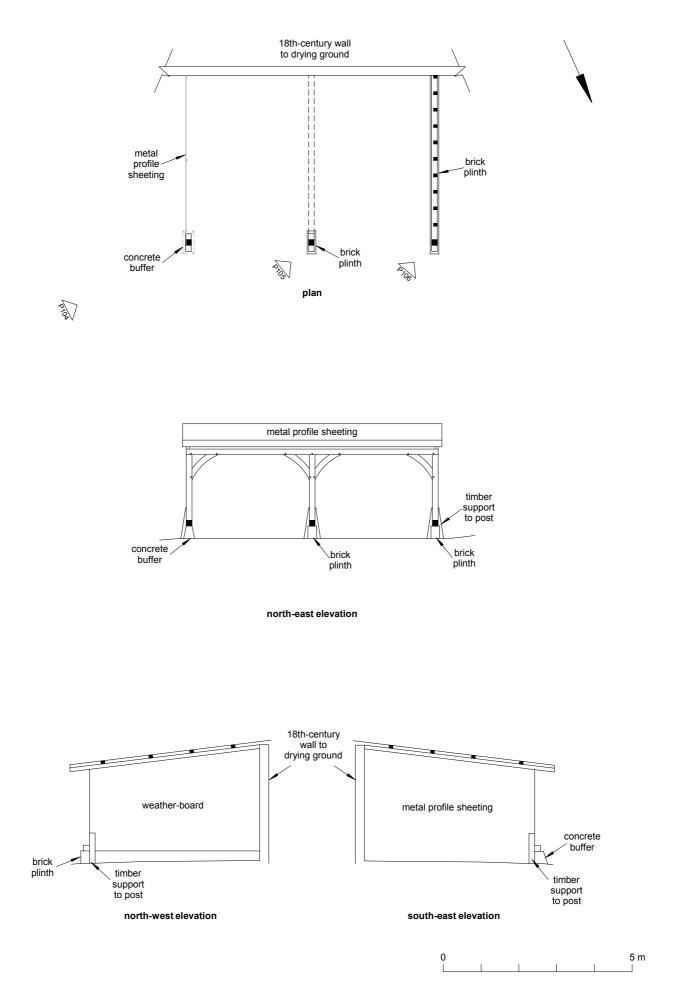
Structure 22, 19th-century tool shed opposite Farm Cottage, plan and elevations.
